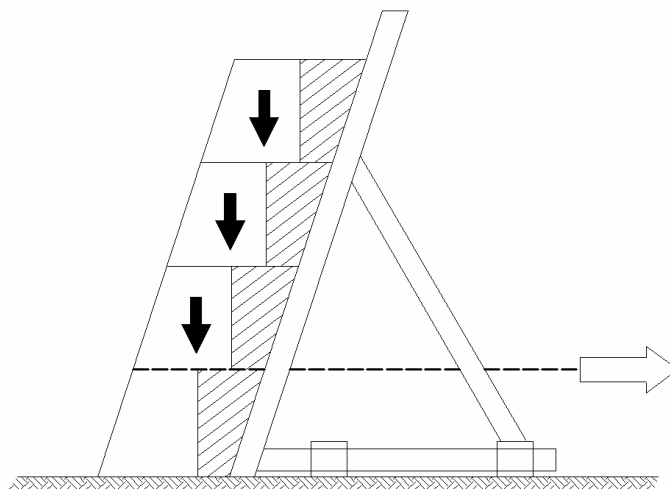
A sketch of possible form work, required to support the face during construction on very steep slopes
